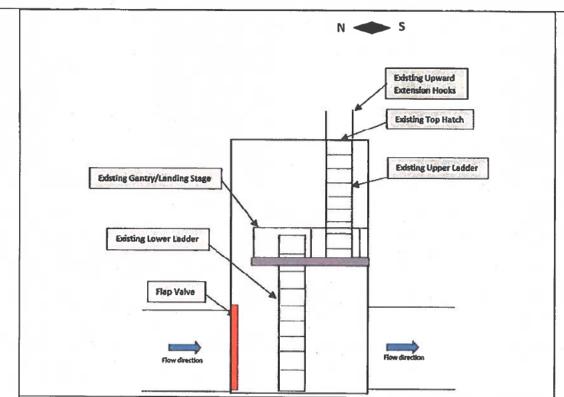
Pevensey West Outfall - Inner chamber (Coast Road). Existing access arrangement (indicative only).
